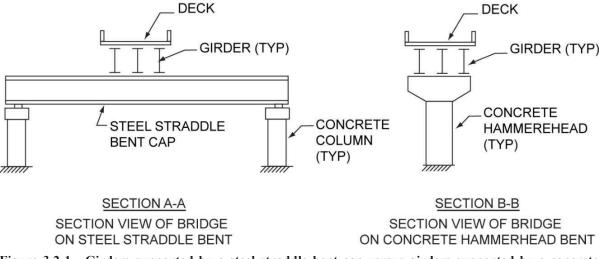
Girders supported by a steel straddle bent cap versus girders supported by a concrete hammerhead
